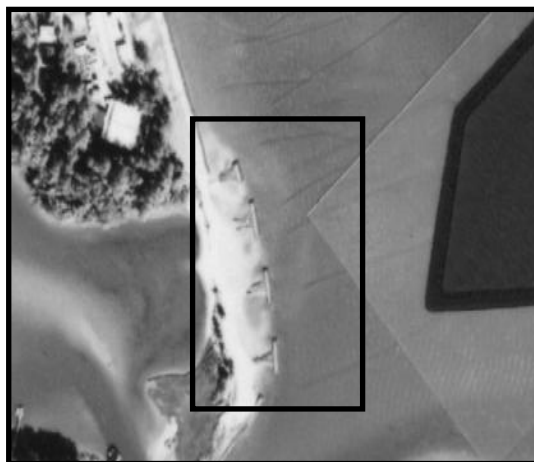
Aerial photo of the breakwater at Yorktown, VA.
